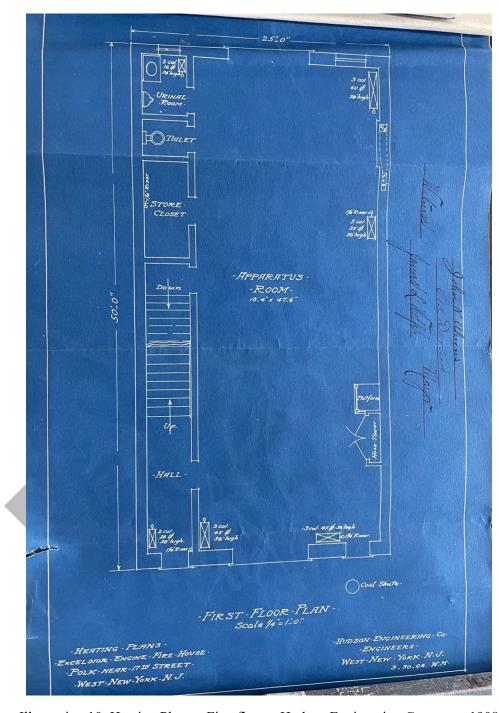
Heating Plans – First floor – Hudson Engineering Company, 1908 (This plan likely shows the original configuration of the first floor)
